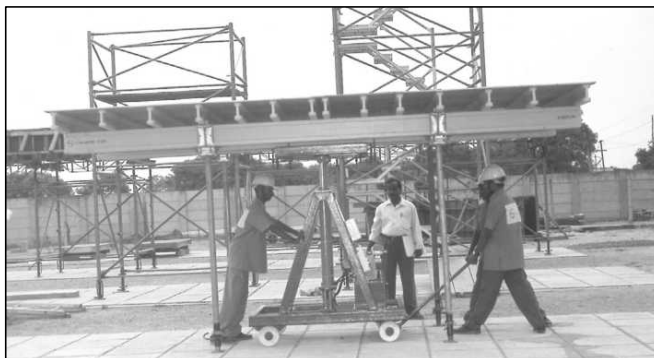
Transportation Arrangement for Table Formwork (Courtesy L&T Formwork).
